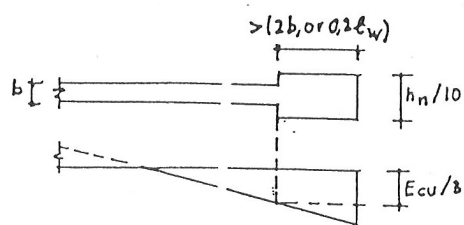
MINIMUM WIDTH REQUIREMENTS
